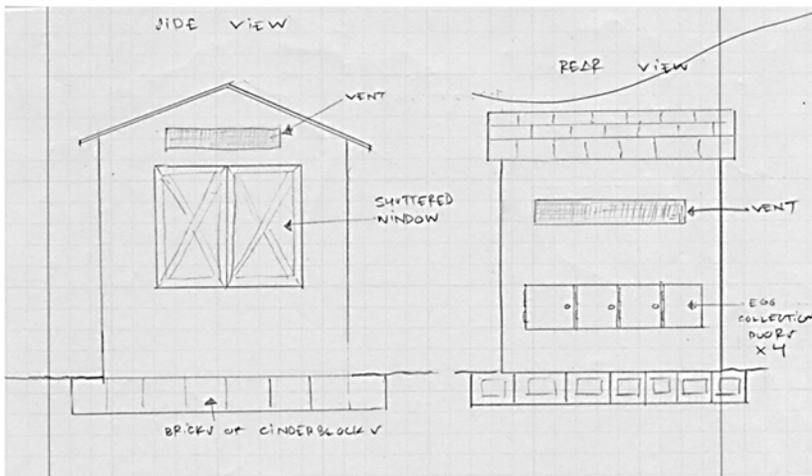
Profile and rear view of Coop With Cinder Blocks drawn by Seth Ehret on 10/14/2014
